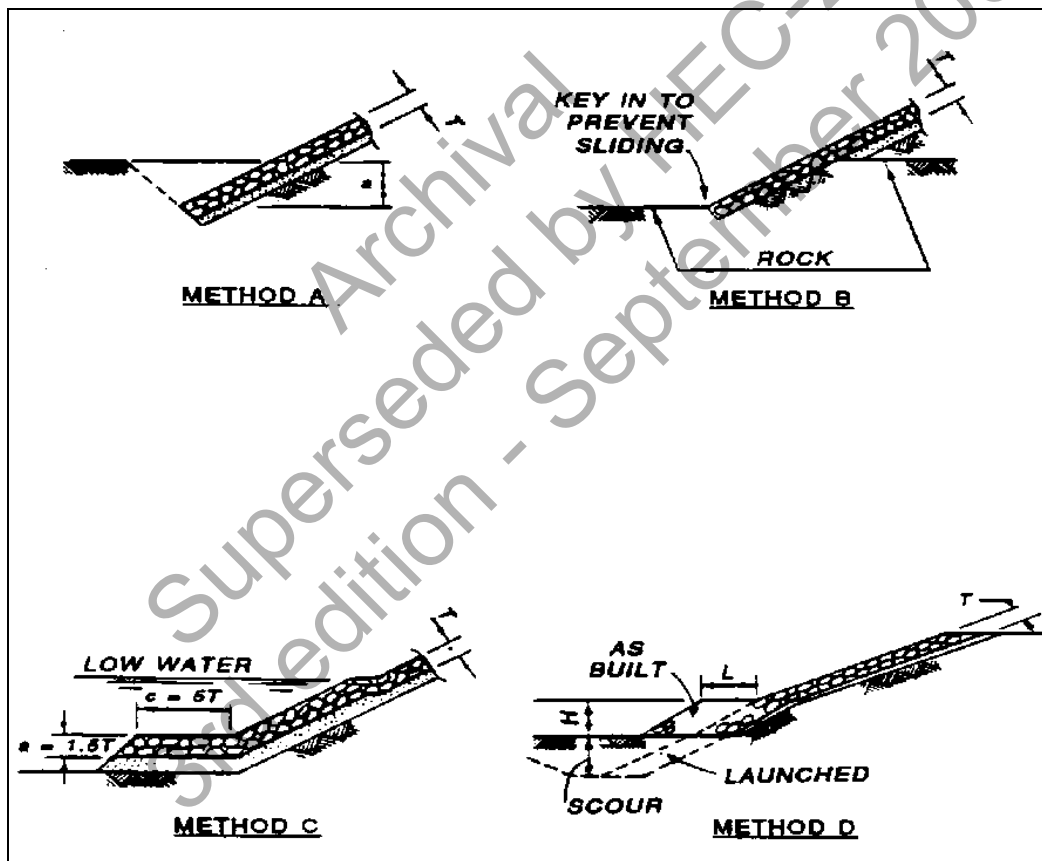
Methods of providing toe protection.⁽⁵⁾
